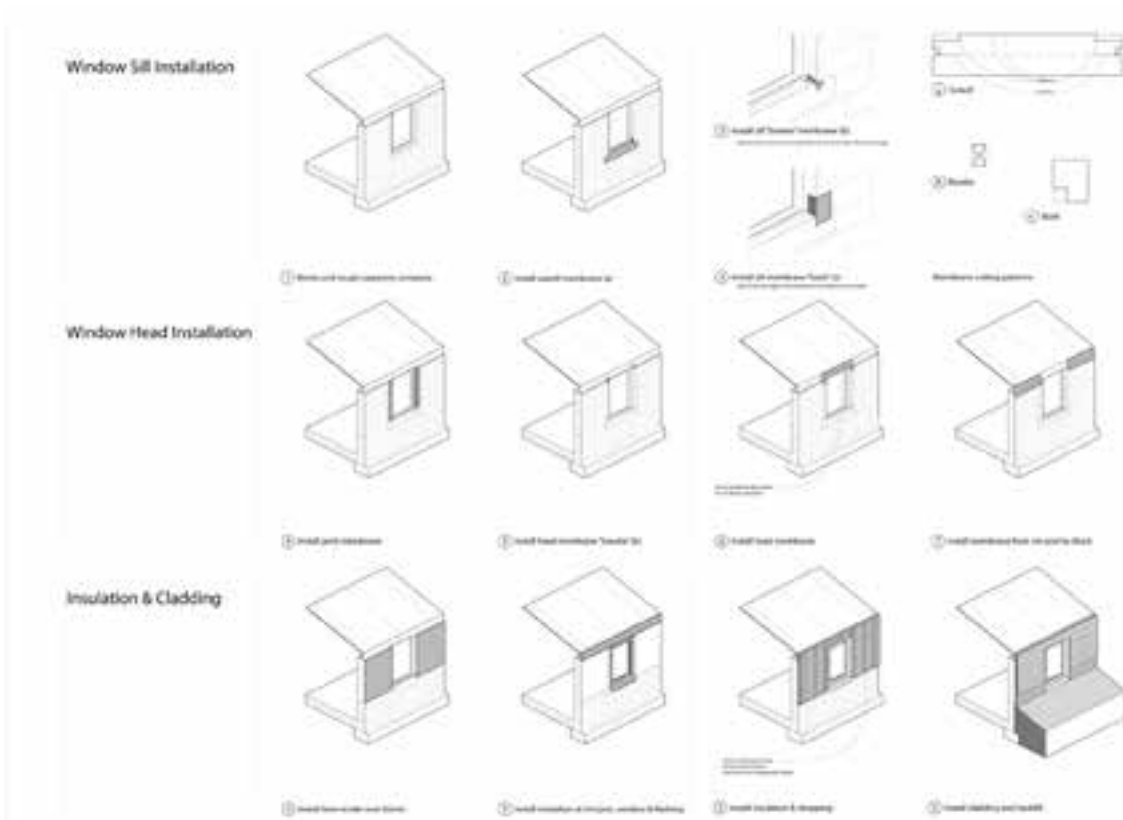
Construction Sequence at Wall Opening, drawing by Lauren Stokes
